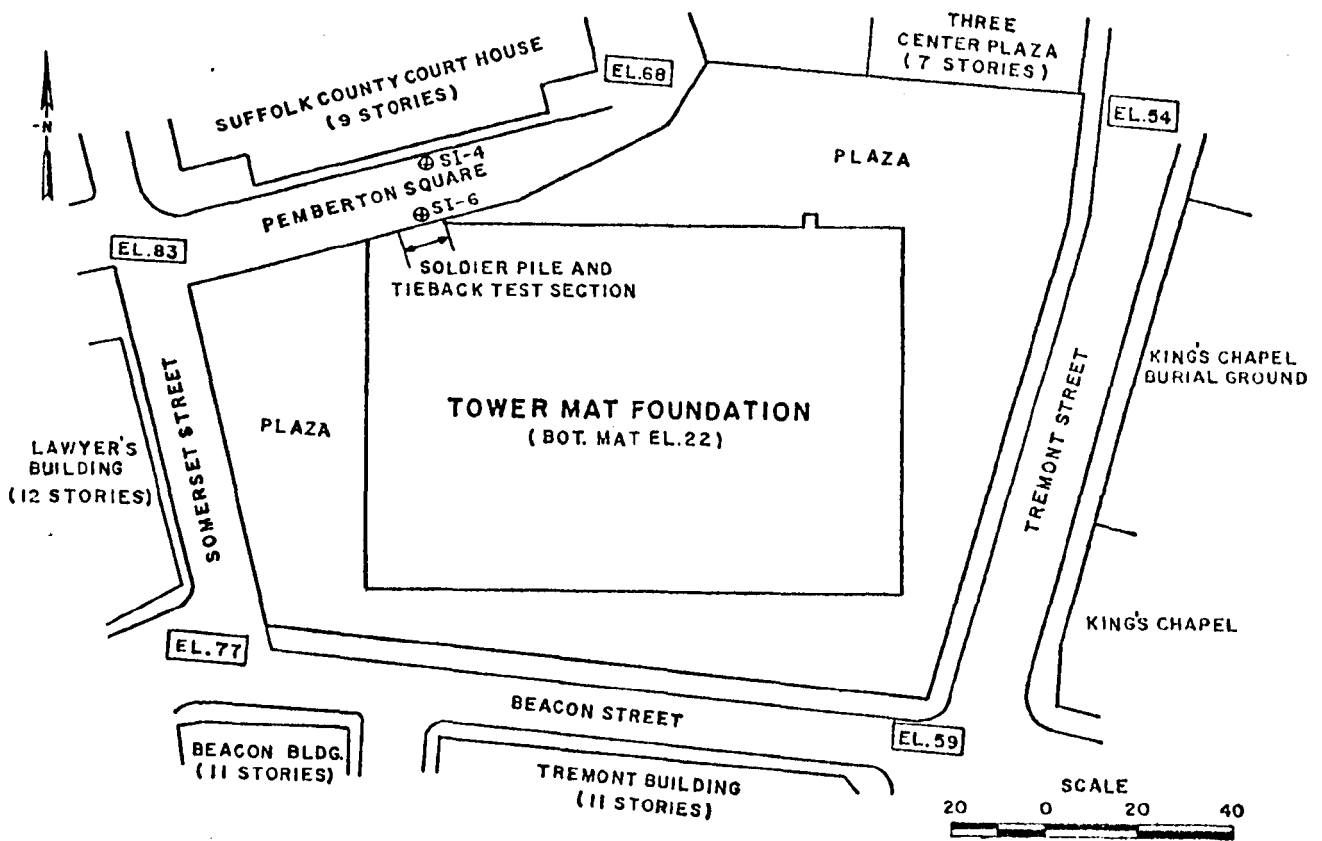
SITE PLAN (After Liu and Dugan, 1972)
